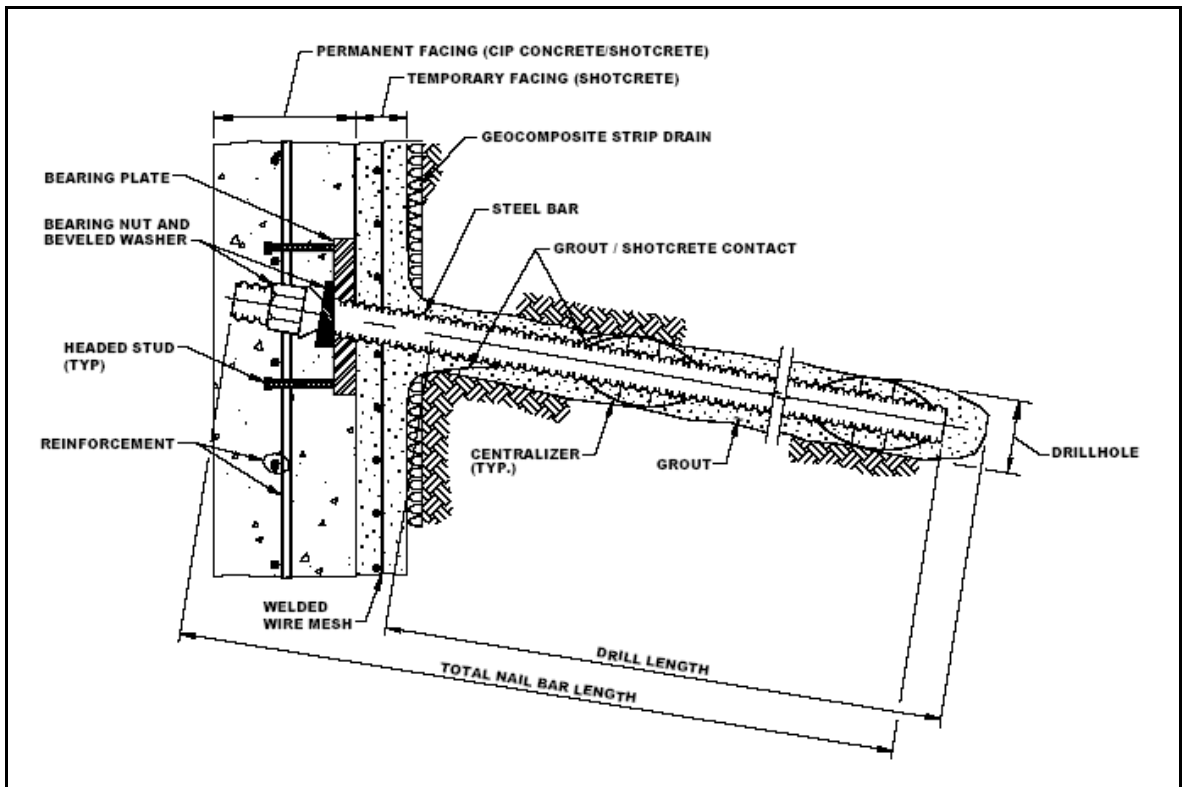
A detailed cross-section of a soil nail (Porterfield *et al.*, 1994)
